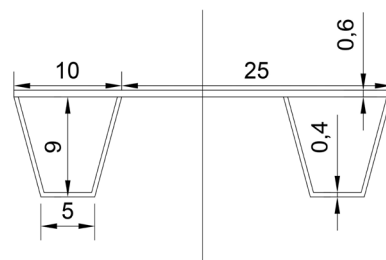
Structural diagram of trapezoidal rib of roof (cm)
